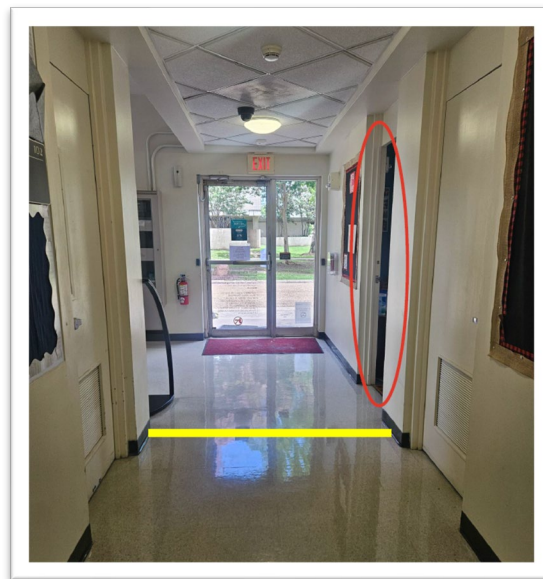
Images of Egress Location; Yellow line indicates wall location, Red circle indicates wall door to be closed in.
